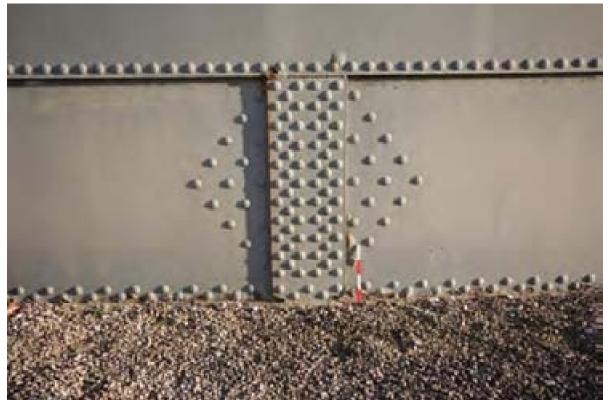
Riveted buffer sheet at base of the tank, Gasholder 6 (PPD16-0009)
